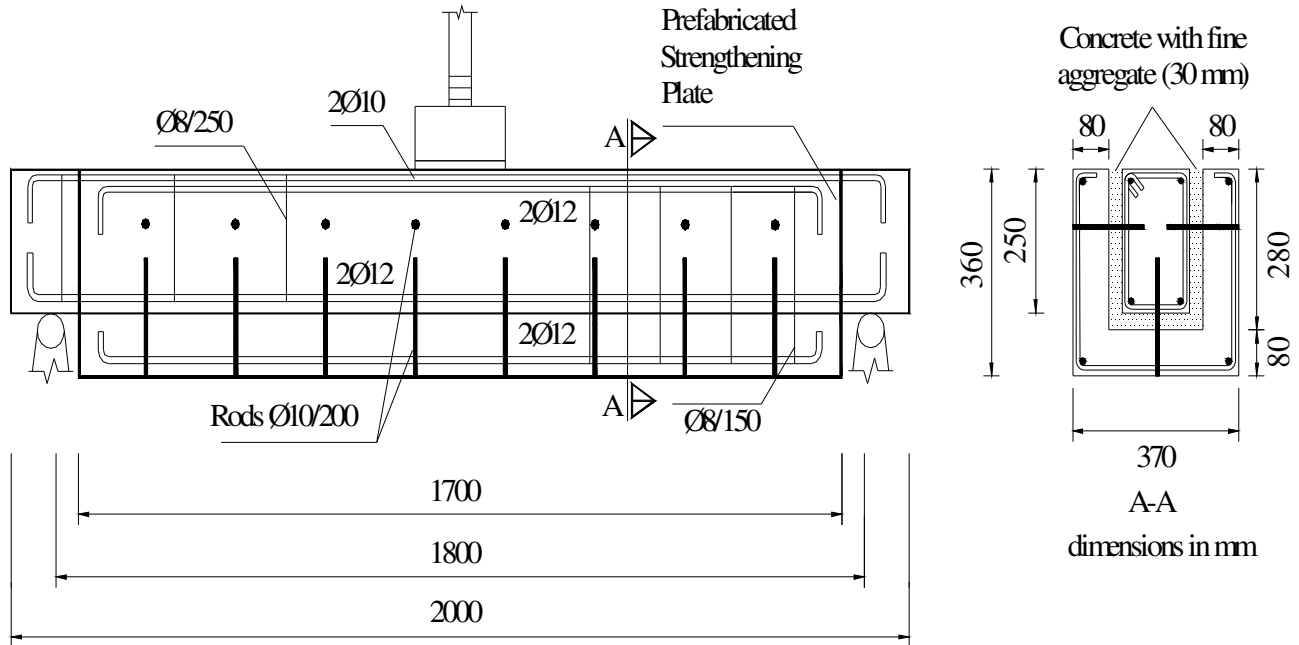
The strengthening with “c” plates of the second type beams named “B”.
